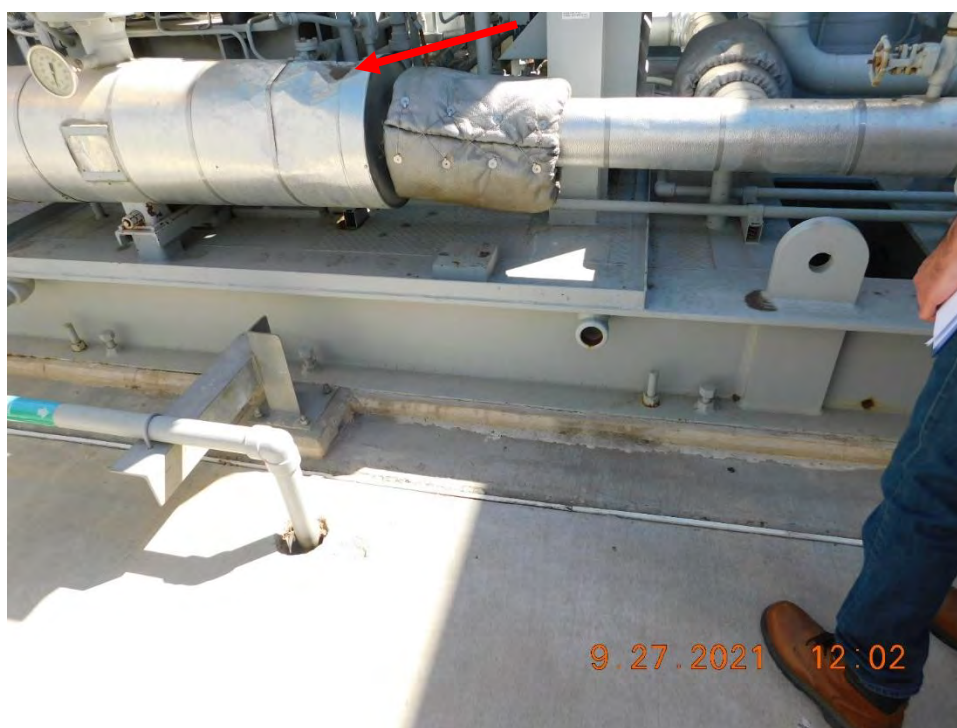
Damaged insulation and jacket in the Natural Gas Compressor building.
